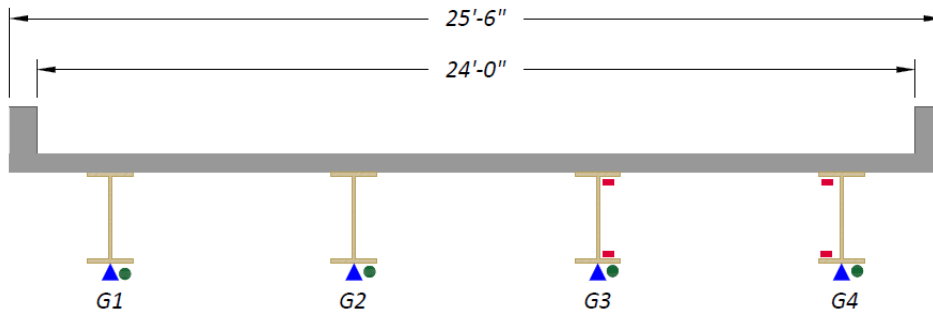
Plan View Instrumentation Layout for Bridge SC-12
